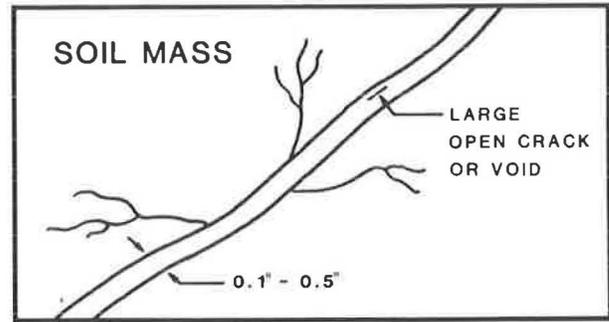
Large soil crack before stabilization with lime/fly ash injection.
